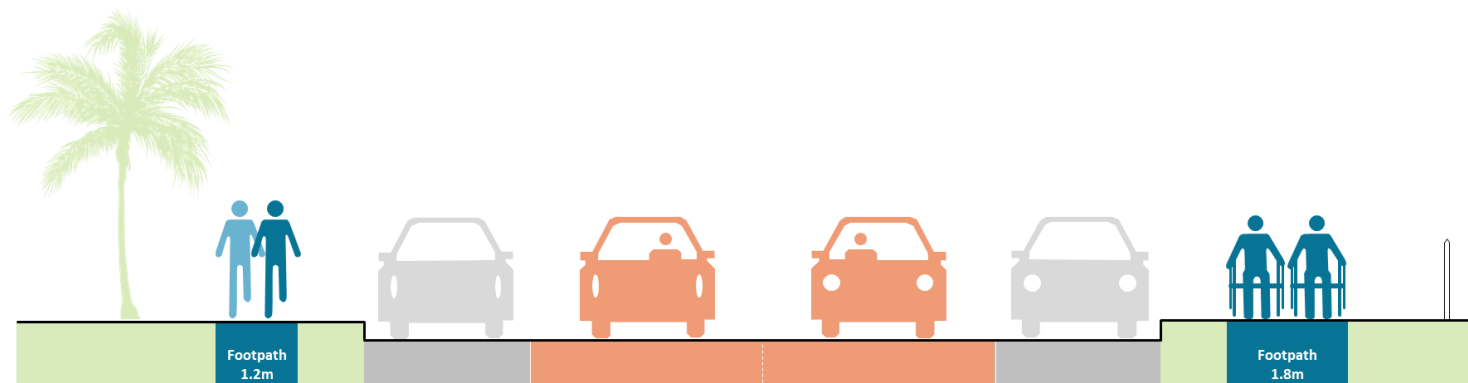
Example cross-sections of a 1.2m and a 1.8m pedestrian footpath
